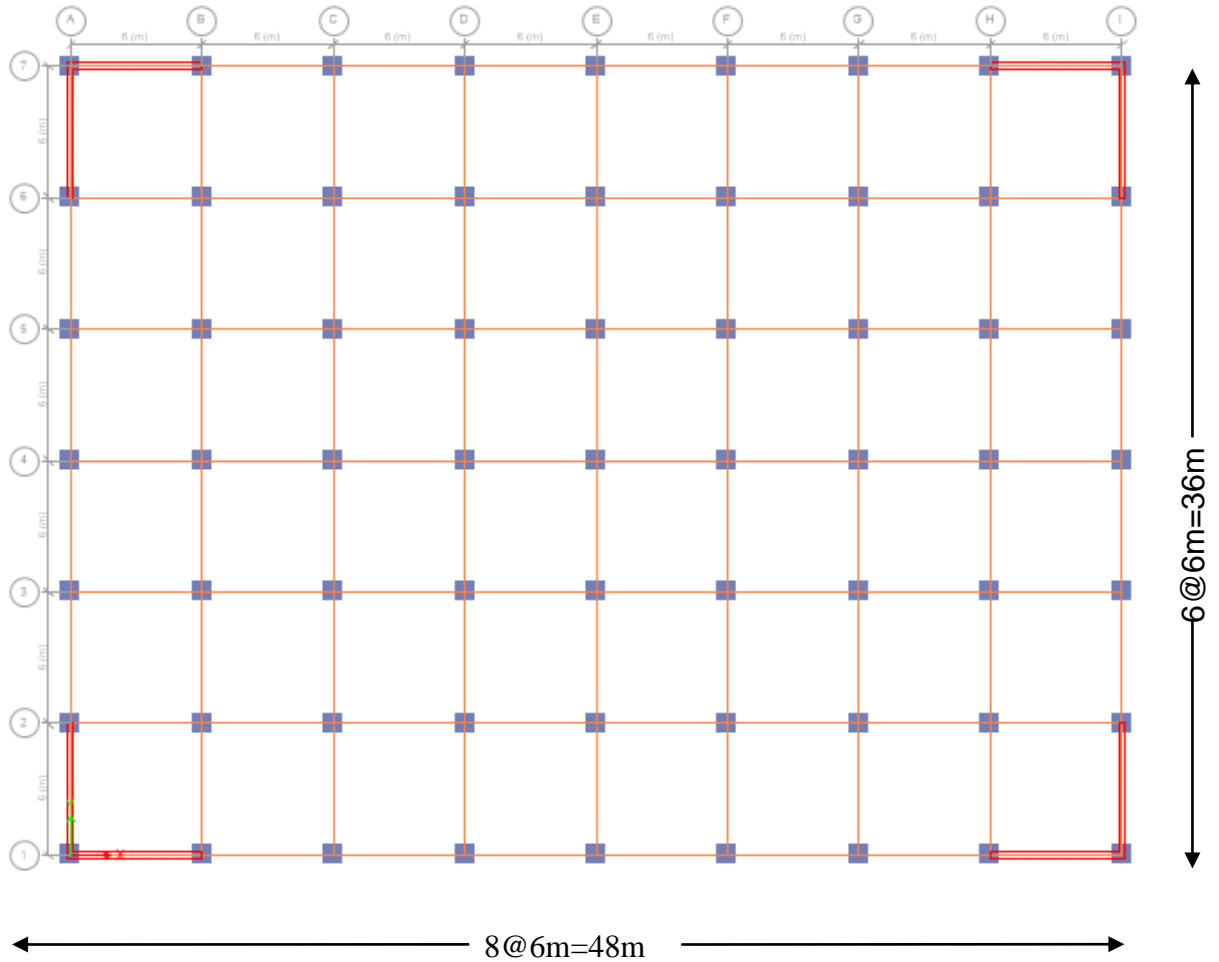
location of bracings and shear wall, when provided in a single bay
